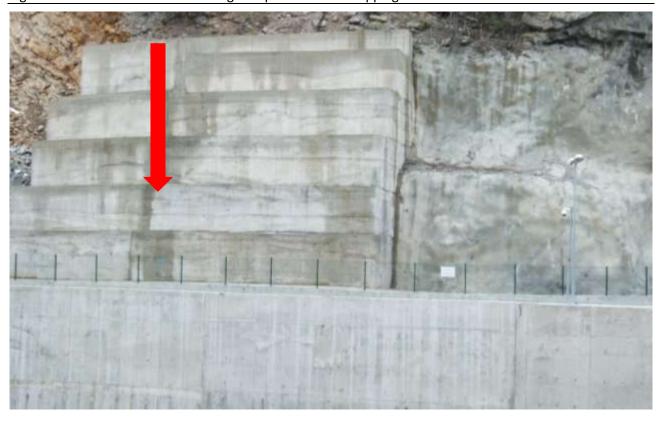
Concrete retaining wall prevents from slipping the dam
